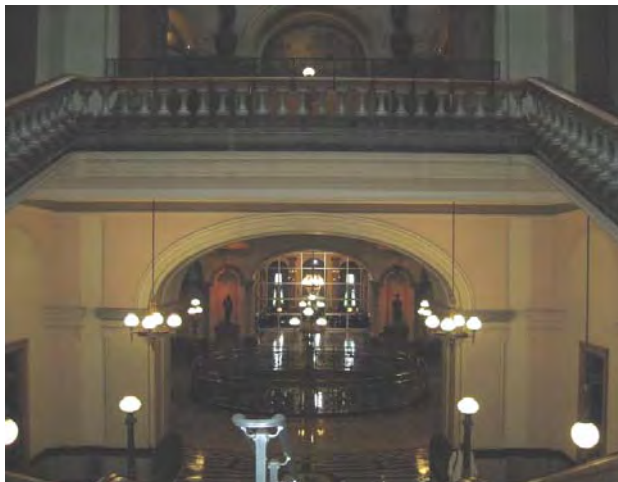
Large plaster clad wrought iron box beam, supporting the header of the grand staircase on the third floor.
